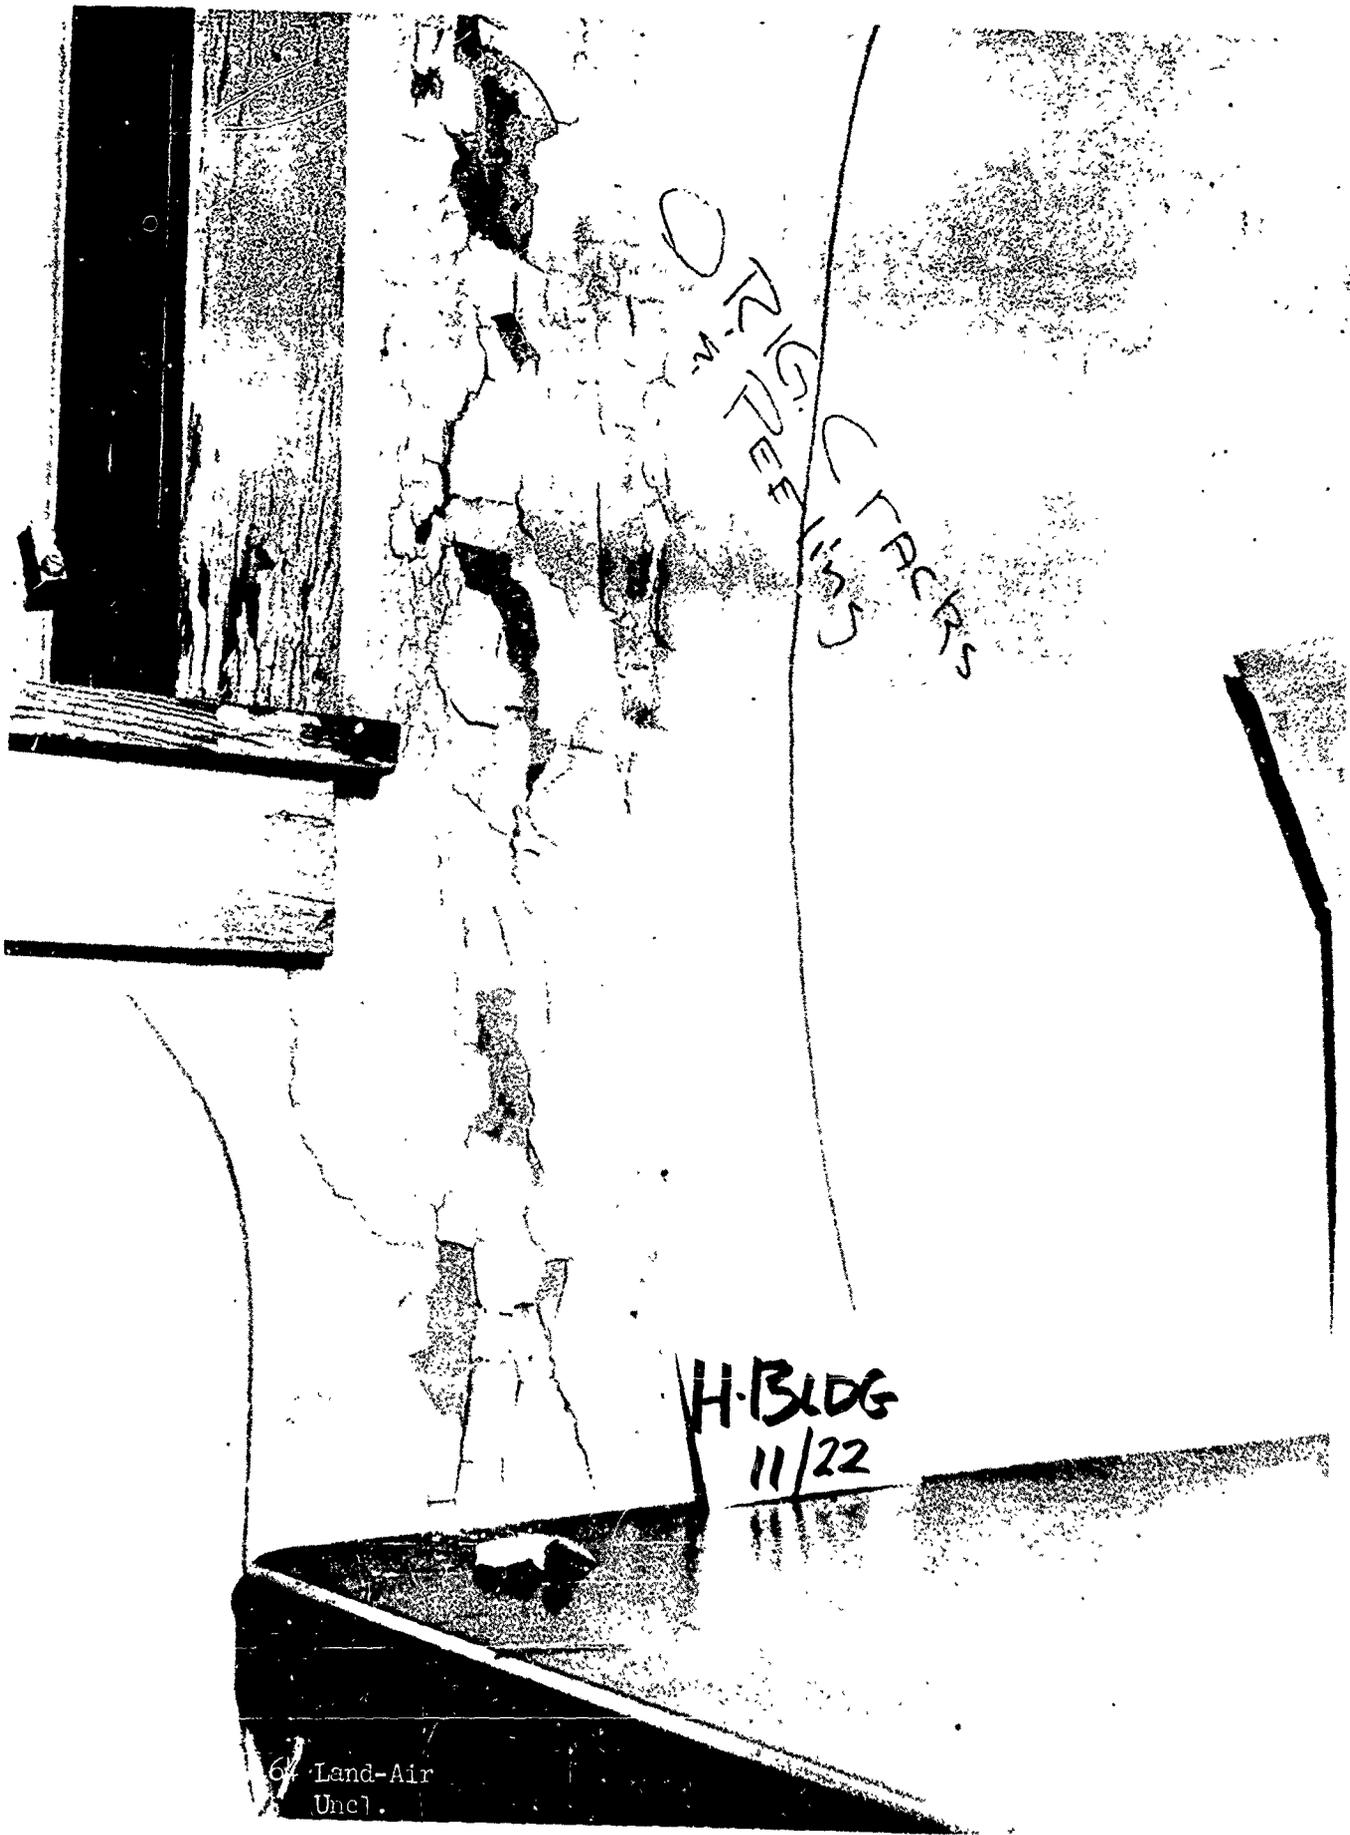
shows the only plaster damage "type 3" to occur during 1494 booms ranging up to 38 psf in strength. This damage occurred under a 12.1 psf boom on a day of runs when the designed overpressure was 10.4 psf. This ceiling was diaphragmed by the boom and failed in tension on the attic side of the ceiling. No cracking or warning could be seen prior to the damaging boom.
